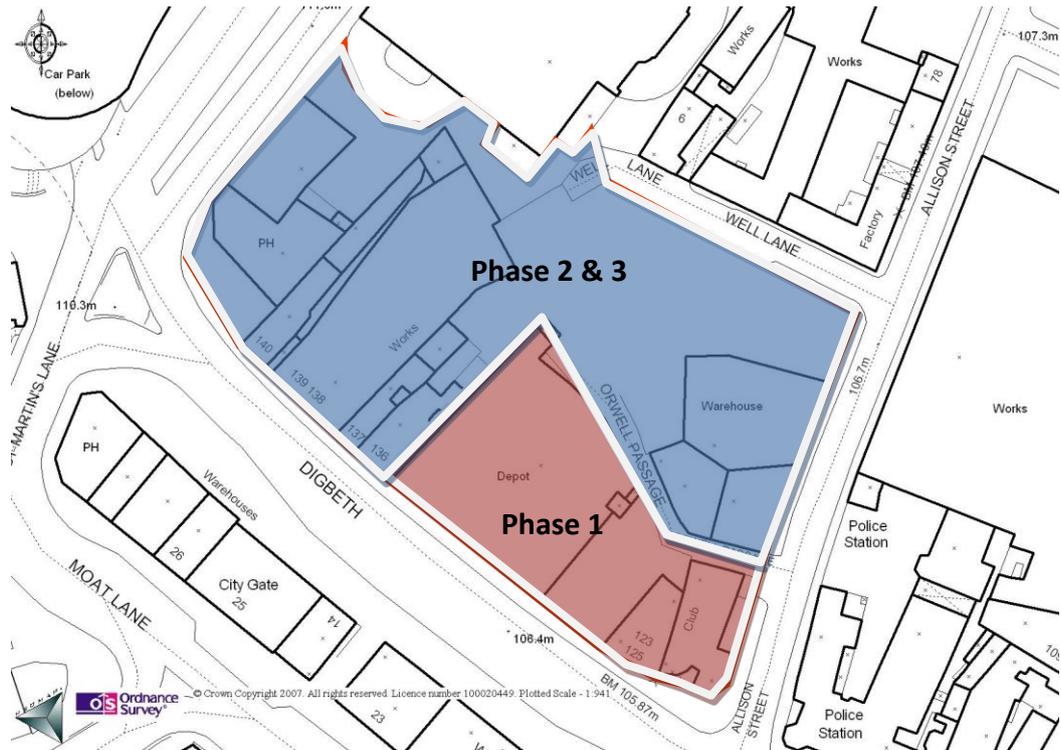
Existing Site Layout (note: Phase 1 is under construction)
